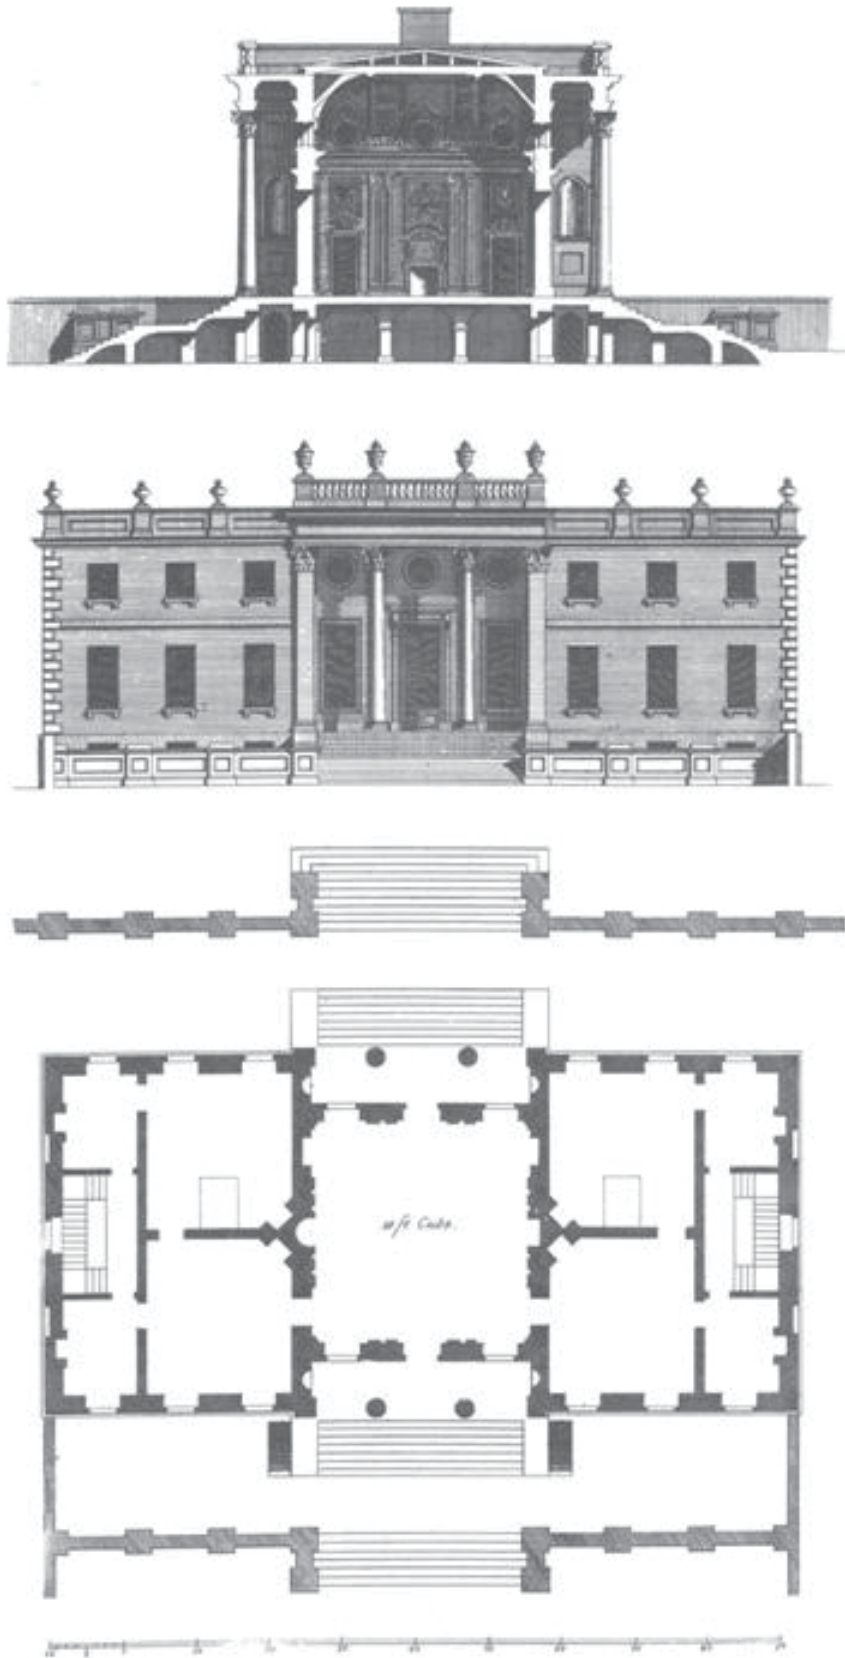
Section, Elevation and Plan of Sudbrook Mansion from Gibbs' *Book of Architecture*, 1728
